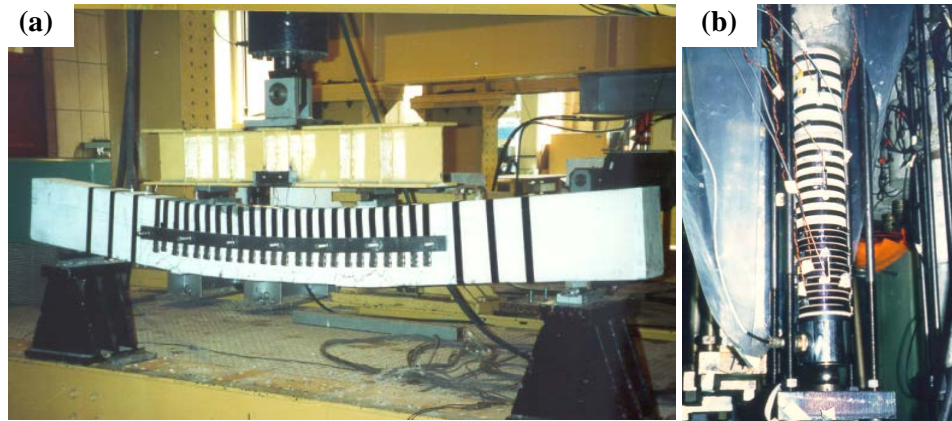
PTMS strengthening on (a) beams, and (b) columns
